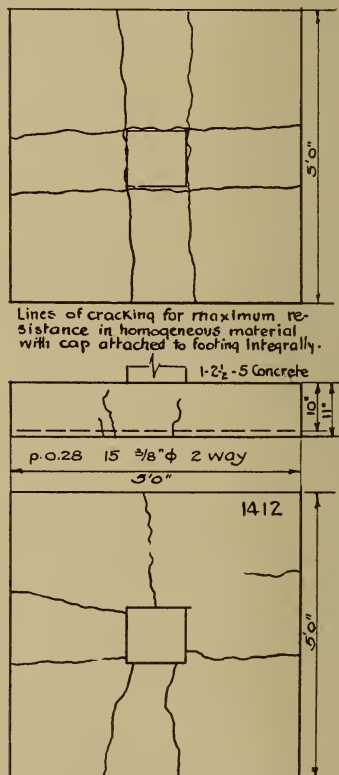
ILLUSTRATING CRACKS ON BOTTOM OF REINFORCED CONCRETE FOOTING—TYPICAL TENSION FAILURE. (Talbot.)
